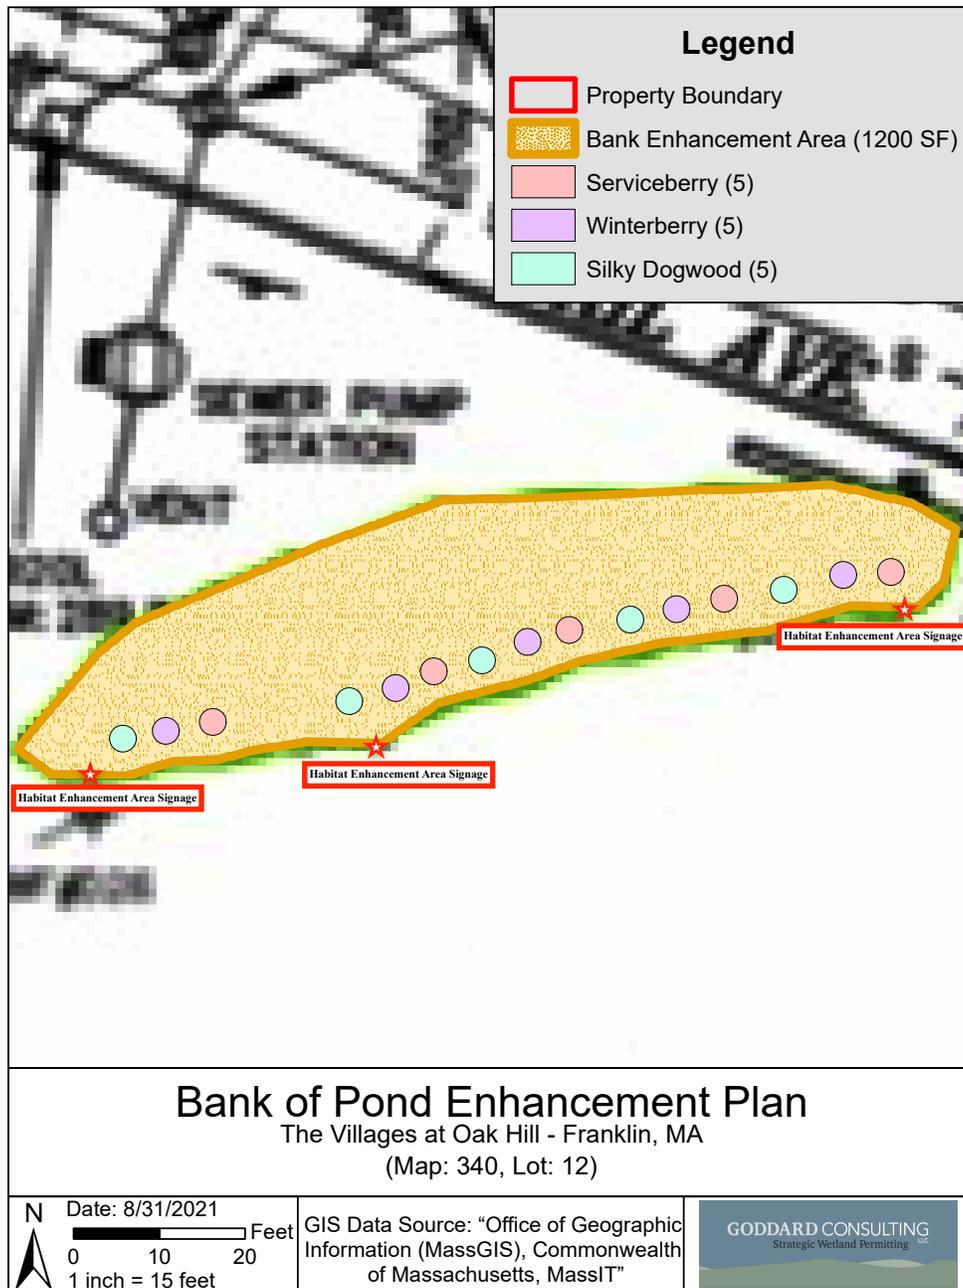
Originally Approved Planting Plan for Bank of the Pond
